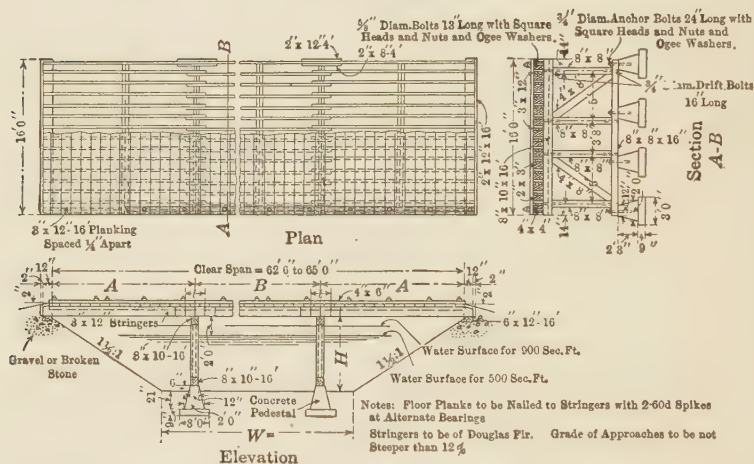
Multiple span wooden stringer highway bridge. Milk River Project, Mont.
